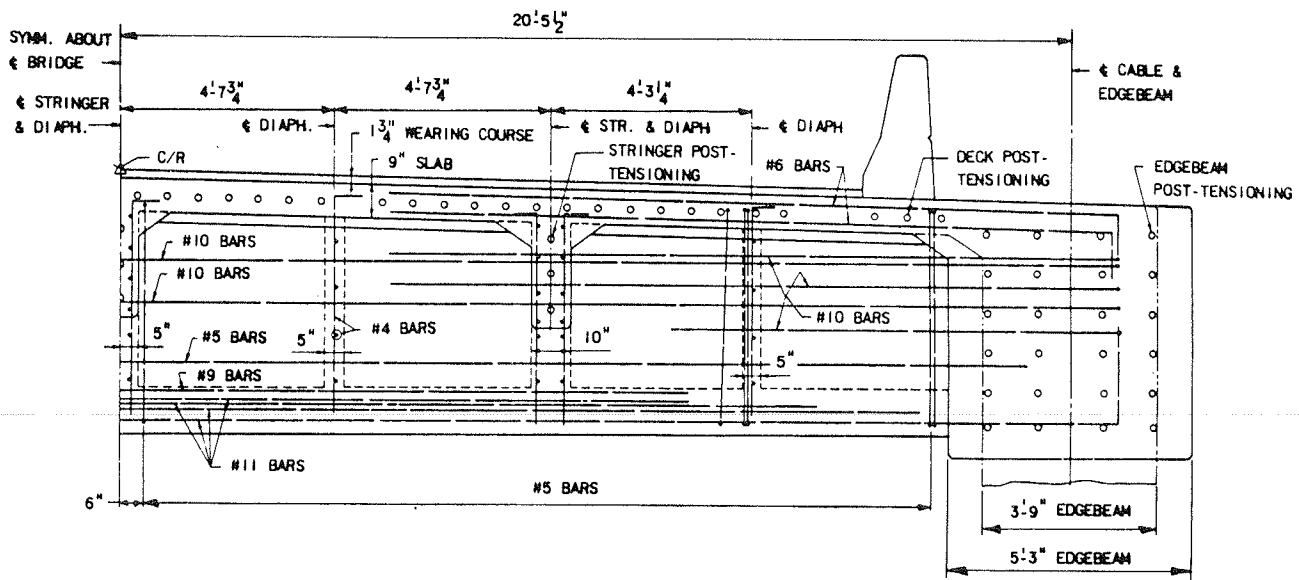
Concrete alternative: floor beam reinforcing details.
